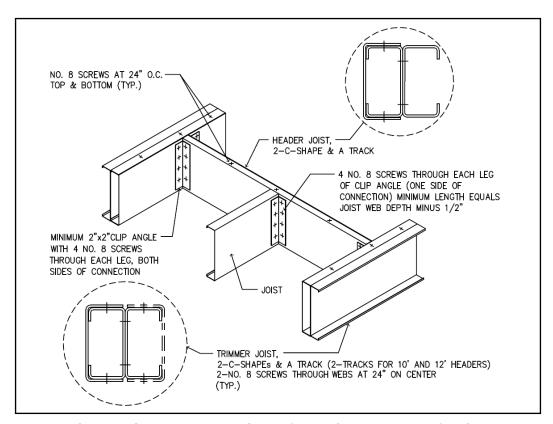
Floor Header to Trimmer Connection—Twelve-Foot Opening (Eight-Foot and Ten-Foot Openings Similar)
